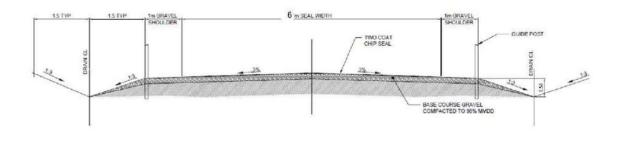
Typical Rural Road Cross Section (Brad Brooksby Consulting, 2021)
